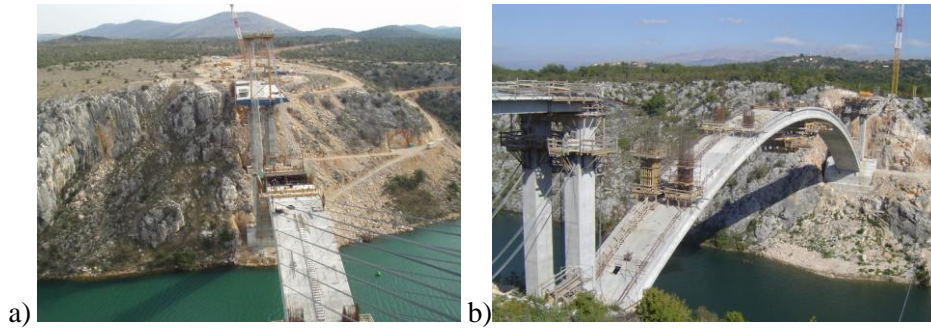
a) Bridge over Krka River; b) Bridge over Cetina River
